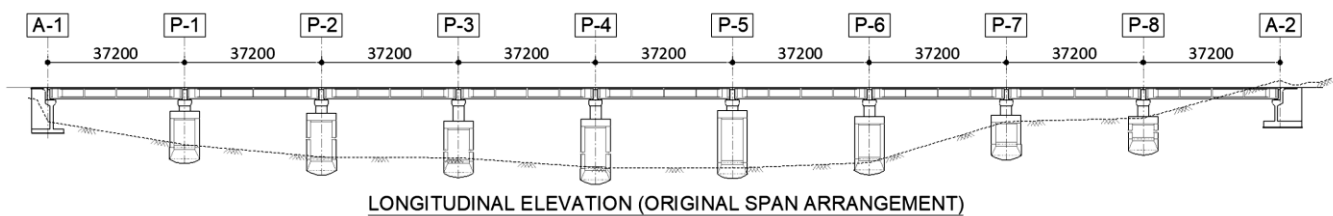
Span Arrangement for the Bridge as per Original Design
